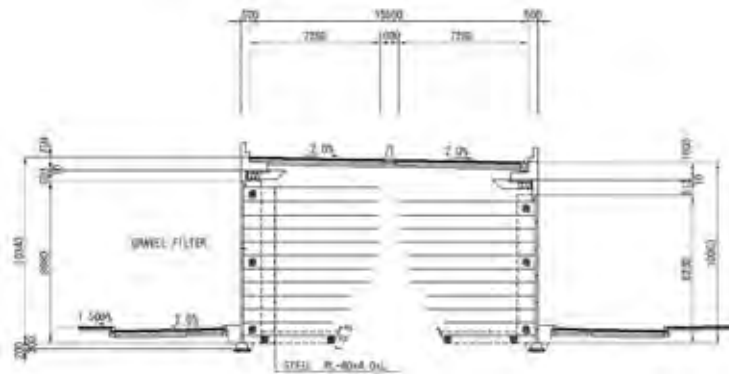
Cross Section of Reinforced Earth Wall of Approach Road (Engels Street)
